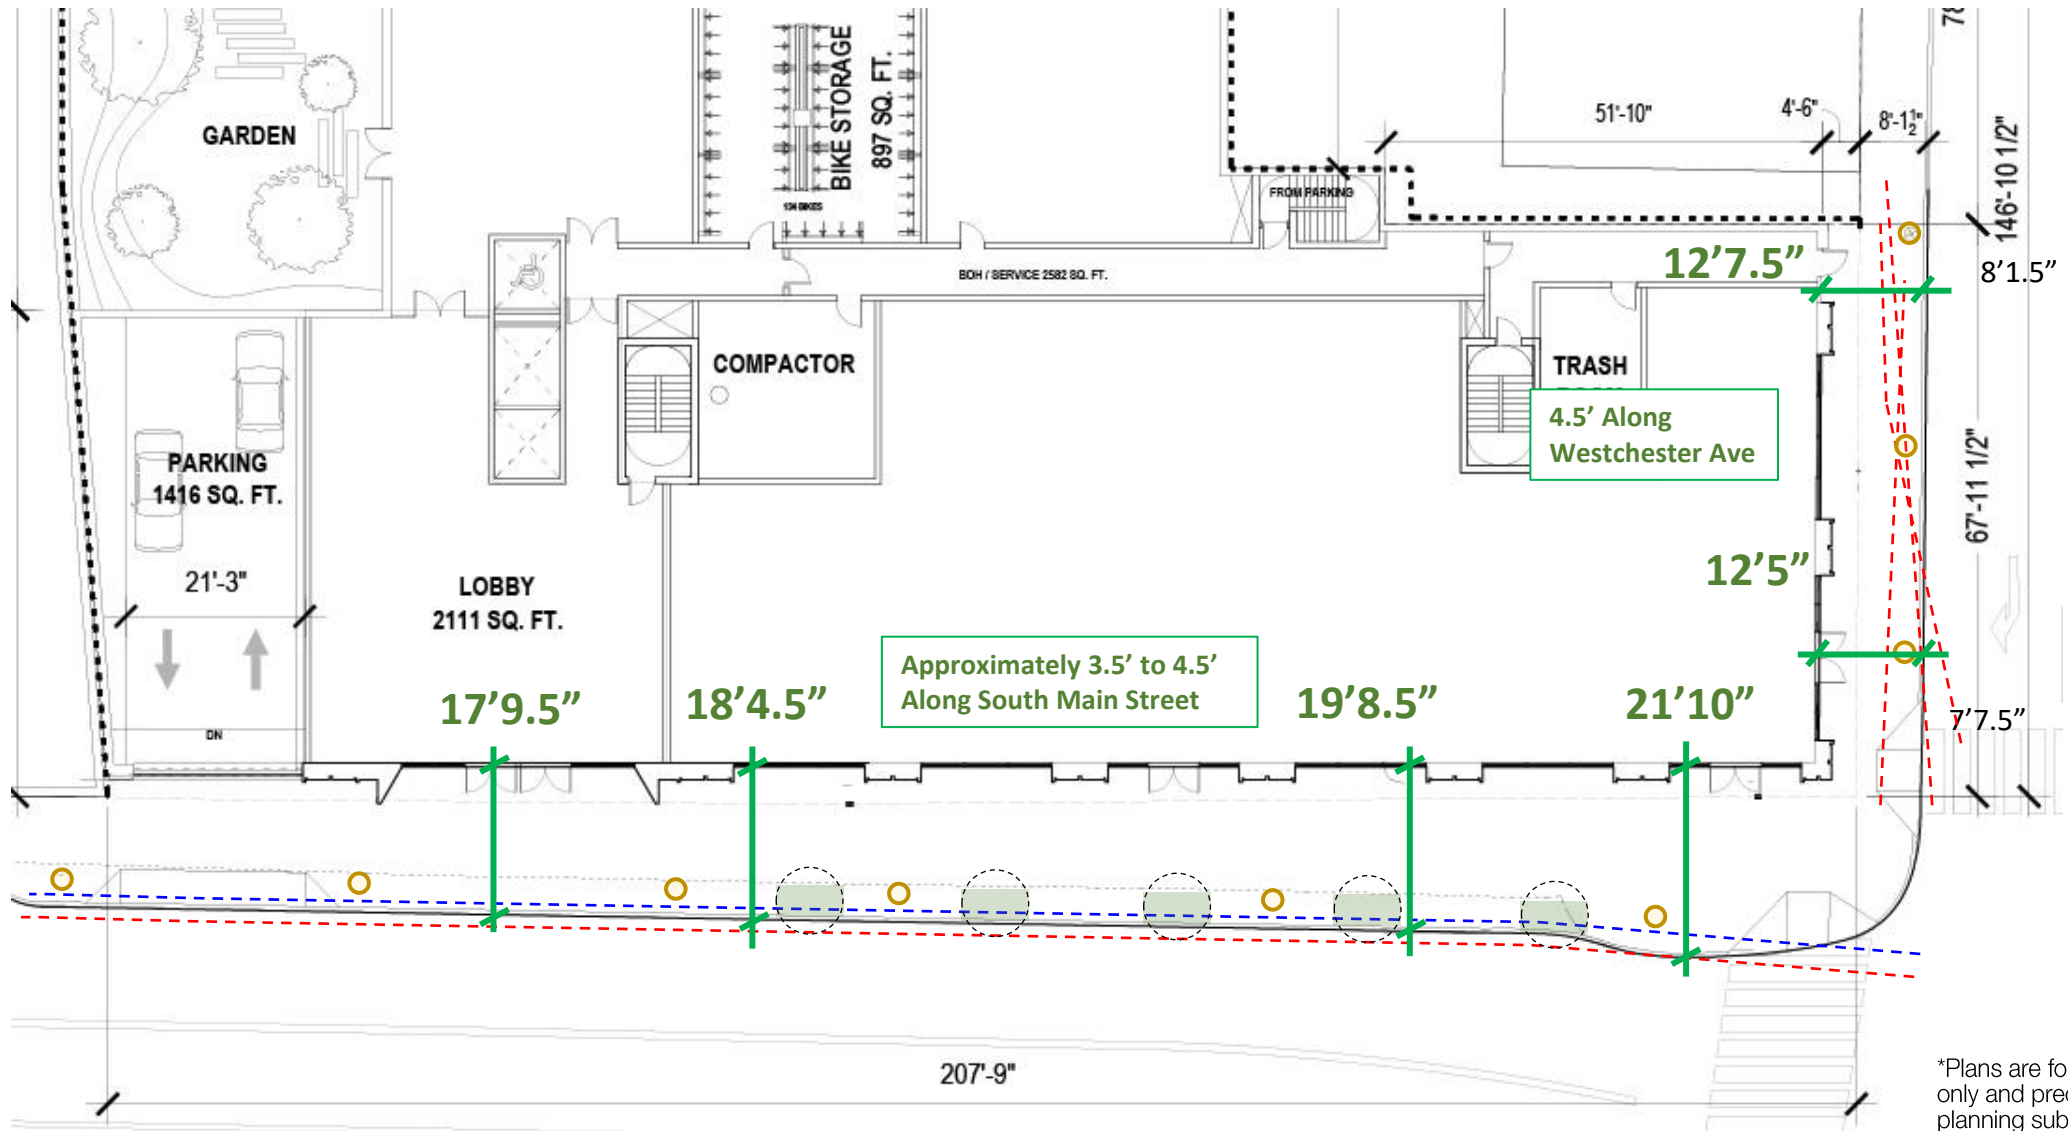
Exhibit B | Public Amenities - Existing Sidewalk Conditions
